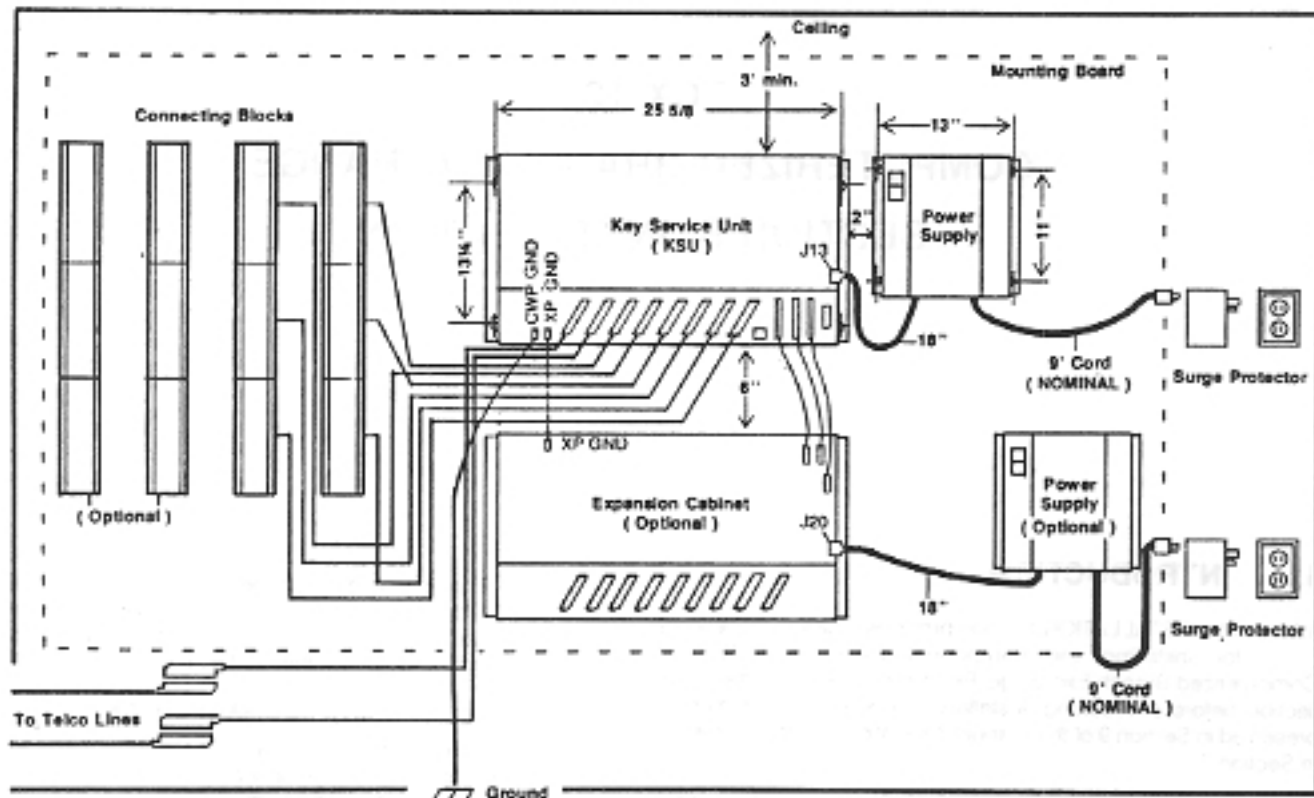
INSTALLATION LAYOUT, TCX-128
